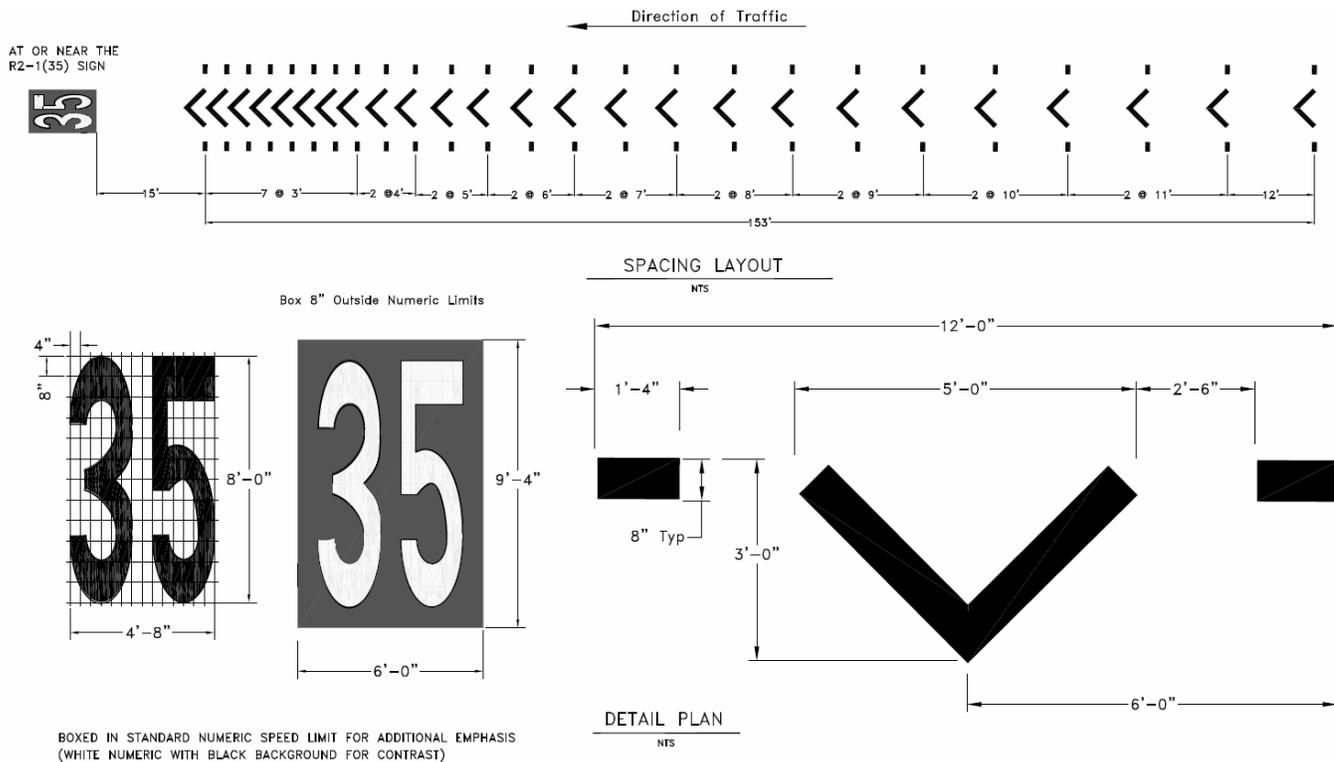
Layout and Dimensions of Proposal (note striping will be white thermoplastic)
